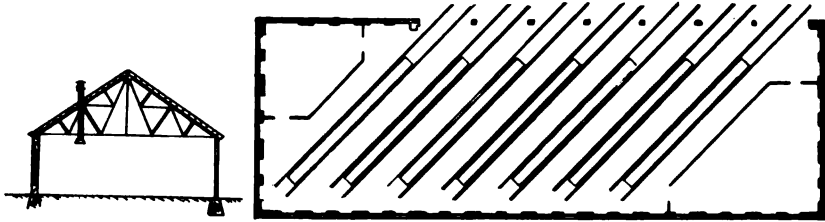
Section and plan, square engine house, Towanda, Pa.
